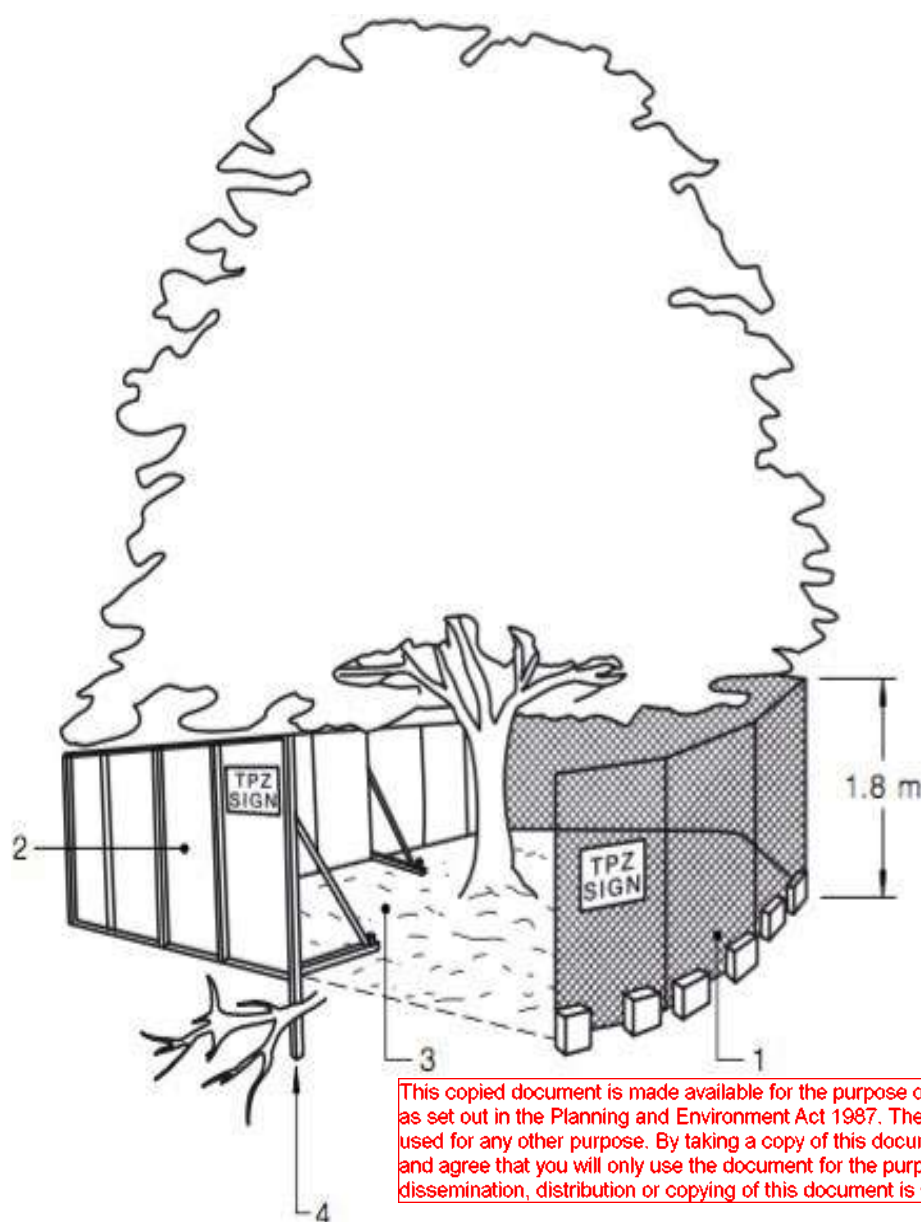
Example tree protection zone with fencing, signage, mulch and bracing (AS4970-2025).
